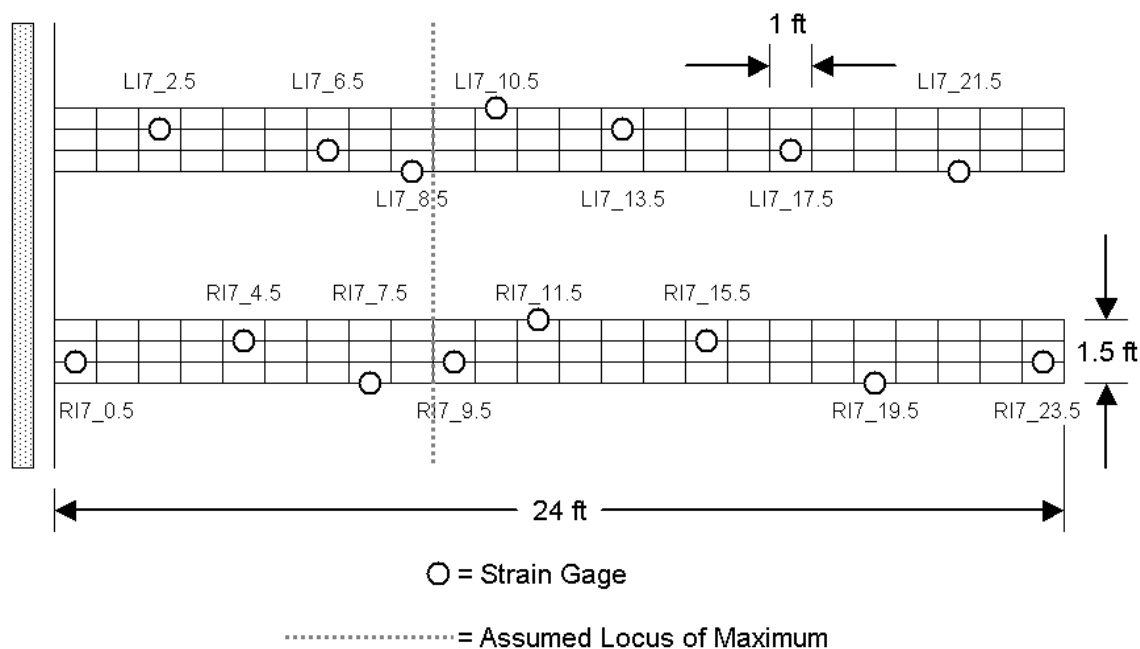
Plan view of instrumented primary bar mat IL7 at level 7 located in the intermediate and primary reinforced section.
